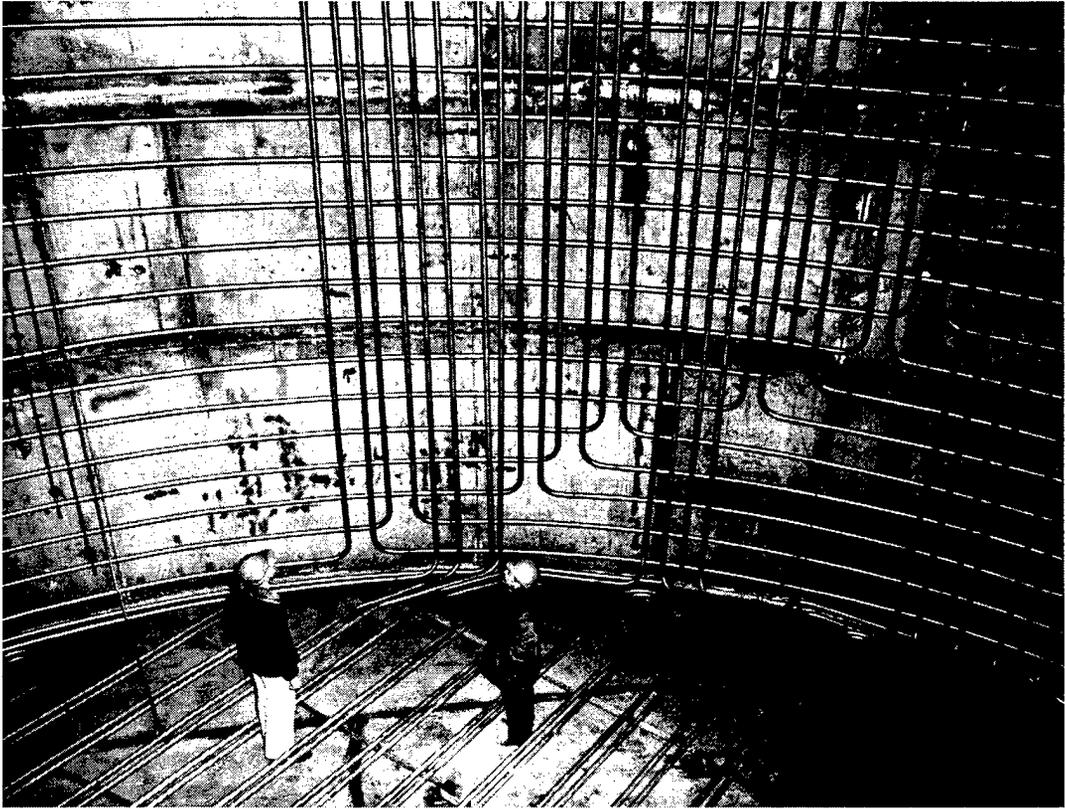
Cooling Tubes Lining the Walls and Floor of an HLLW Tanks at INEEL
